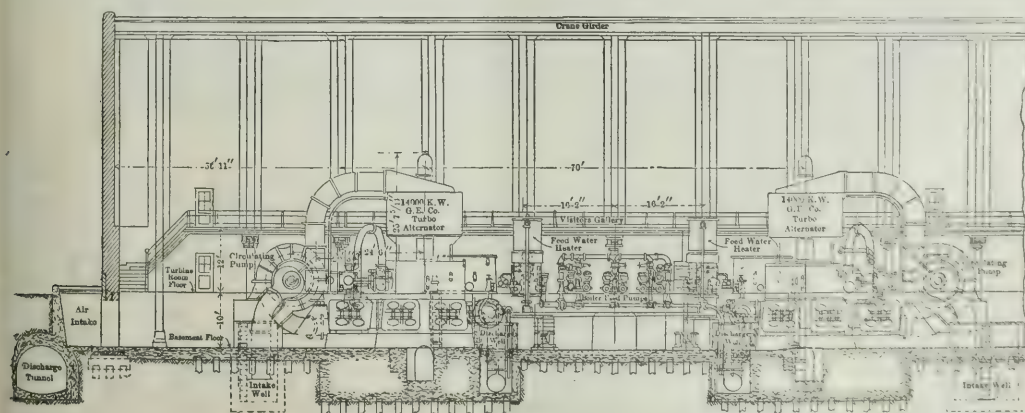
ELEVATION OF TURBINE ROOM, QUARRY-STREET STATION.
